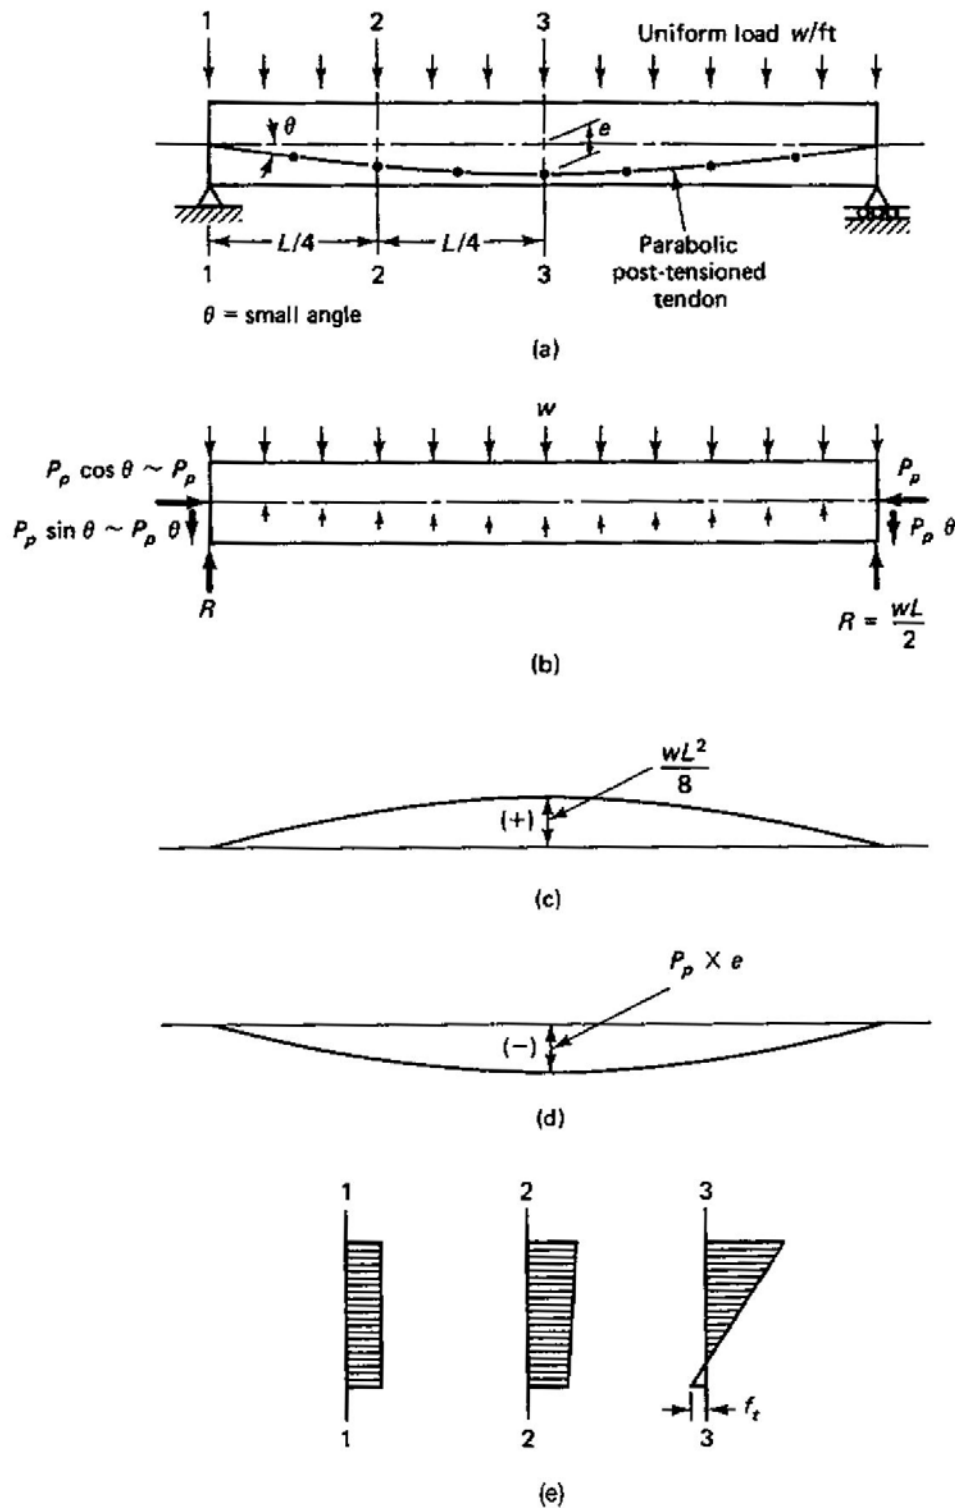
Beam with parabolic draped tendon. (a) Beam elevation. (b) Free-body diagram. (c) External load bending moment diagram. (d) Prestressing force bending moment diagram. (e) Typical stress distribution on sections 1, 2, and 3 (Equation 4.3).
